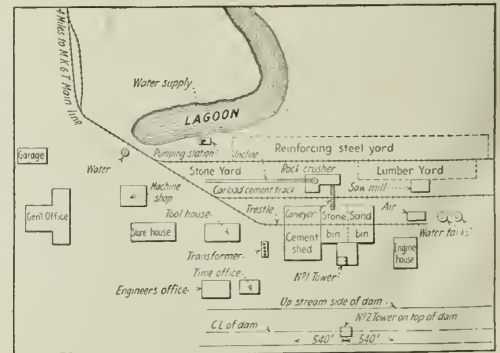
GENERAL ARRANGEMENT OF CONSTRUCTION PLANT
